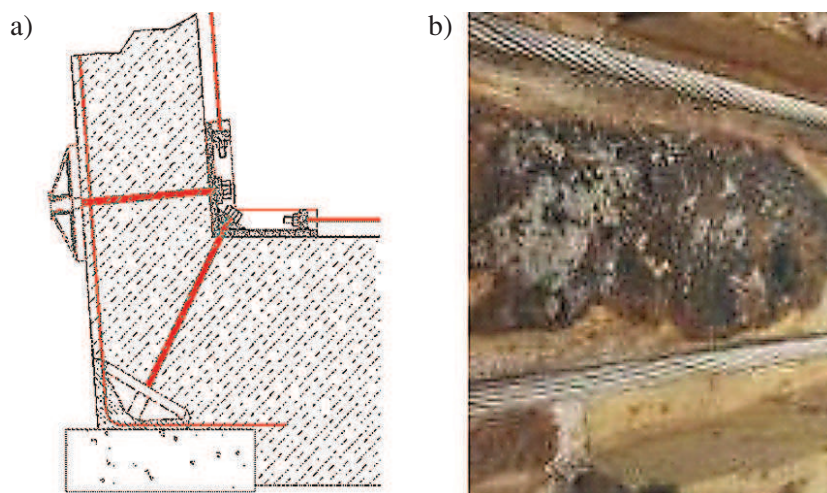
Strengthening interventions, external confining stainless steel cables, Clock Tower, Padova: a) detail of the core strengthened using steel plates and cables; b) detail of the cable insertion between the mortar joints
